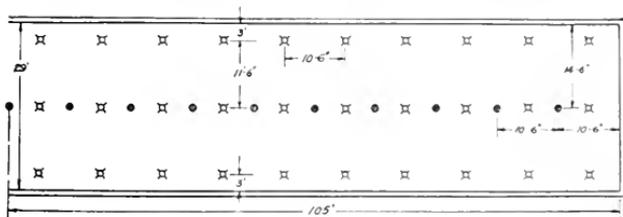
Floor Plan of a Large General Office (Problem 1)
